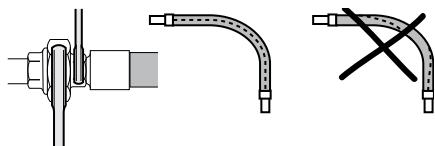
Do not twist the flexible hoses as they are installed. At threaded connections, use a counterhold spanner
